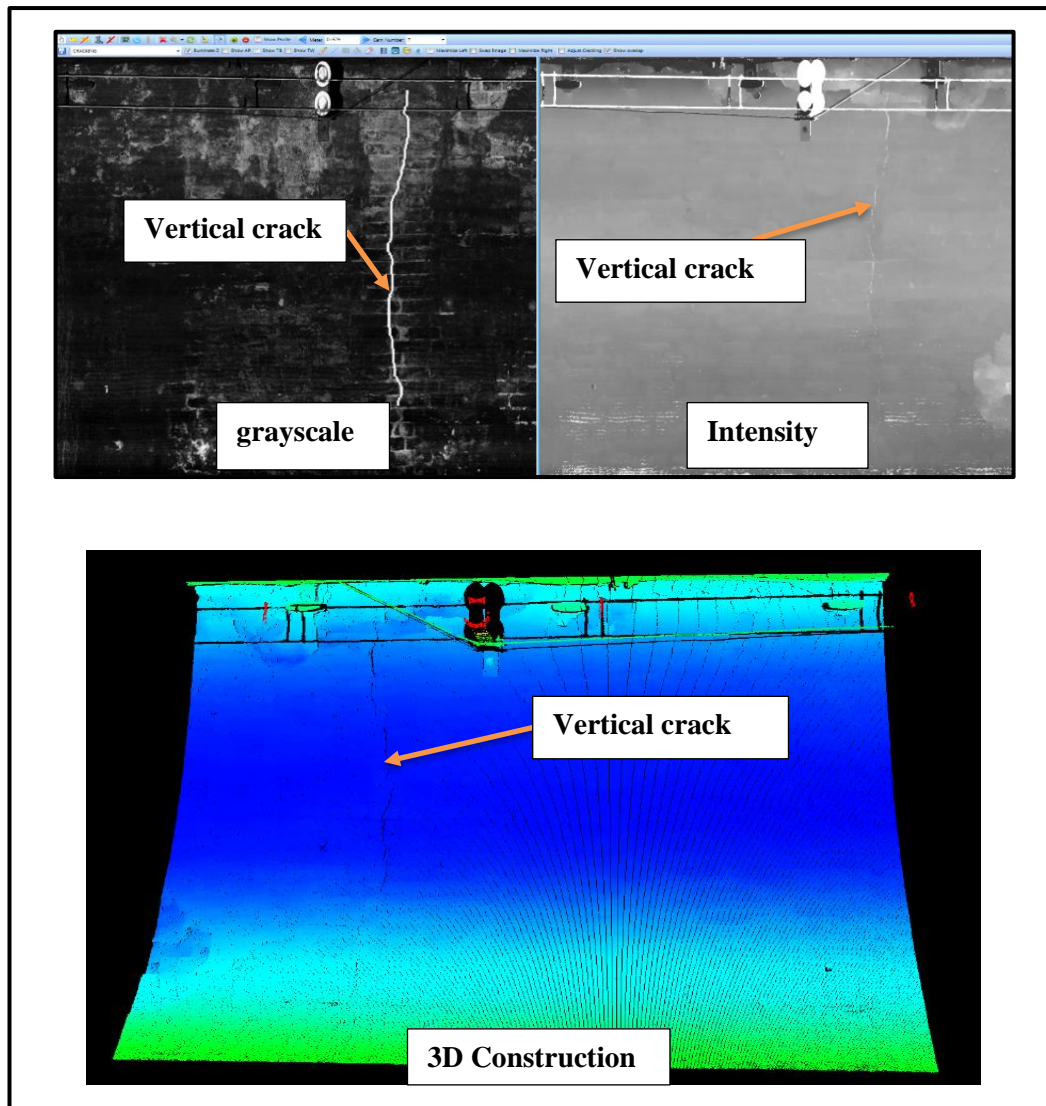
Vertical crack at South abutment 581m from West-2014
